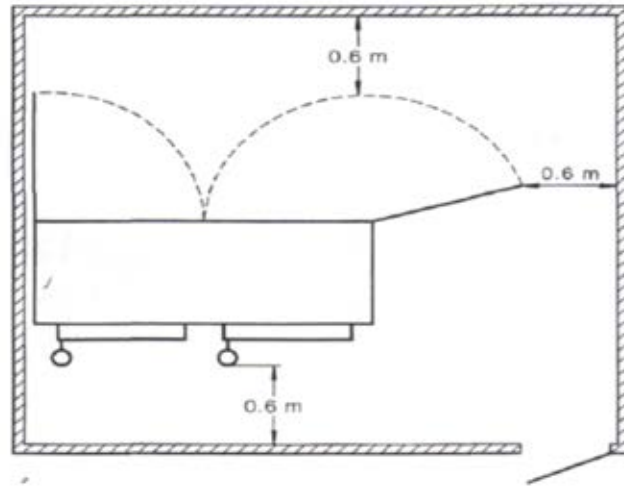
TYPICAL WORKING SPACE REQUIREMENTS AROUND WALL-MOUNTED SWITCHGEAR (LOW VOLTAGE).
